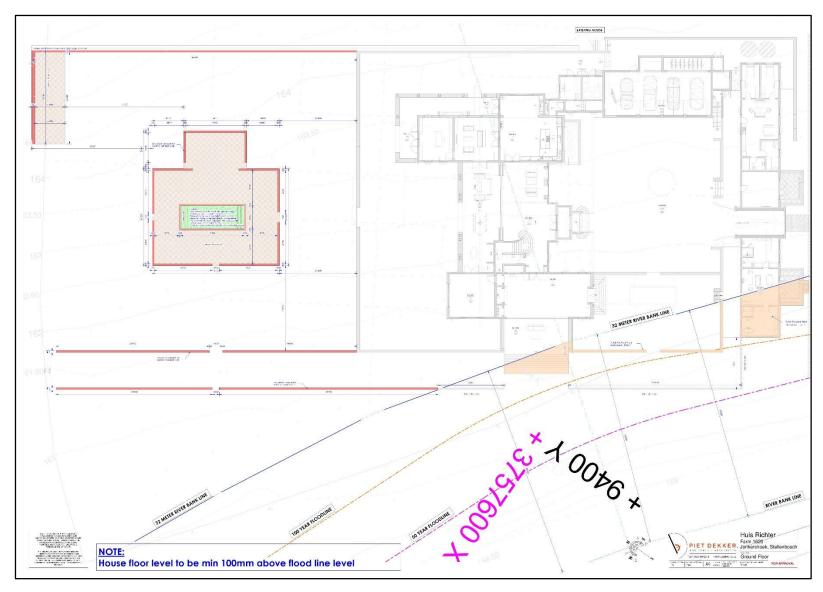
Site Plan showing the proximity of the residential dwelling to the Eerste River on Farm 1620 Stellenbosch.
